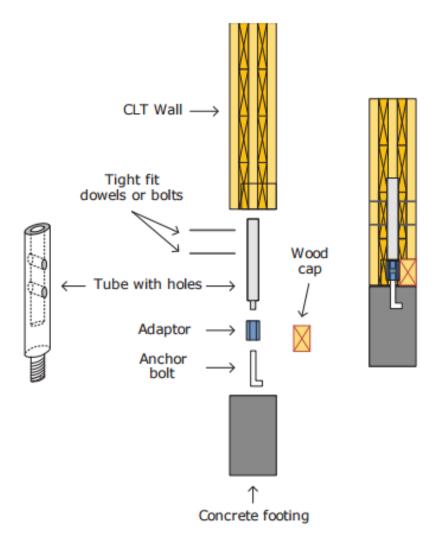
CLT wall to foundation connection using hollow small diameter metal tube/shaft with threaded ends. (Adapted from CLT Handbook)
